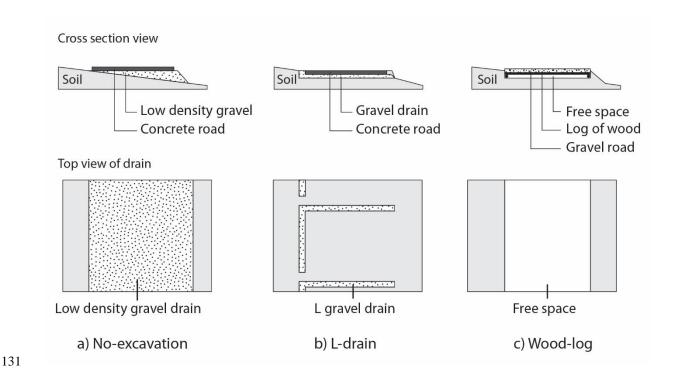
Conceptual road structures, a) No-excavation road structure, b) L-drain road structure and c) Wood-log road structure.
